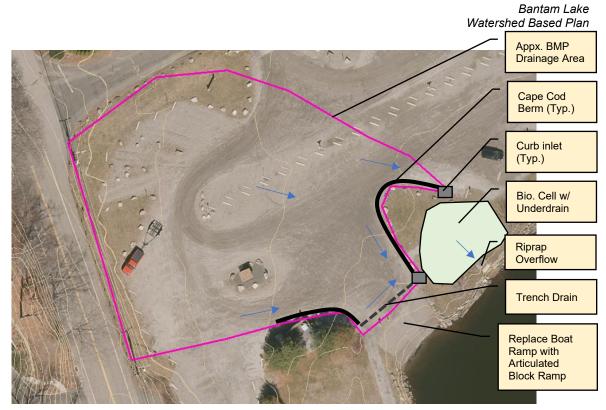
State Boat Launch and parking area at Route 209 and Palmer Road. Proposed BMP Configuration.
